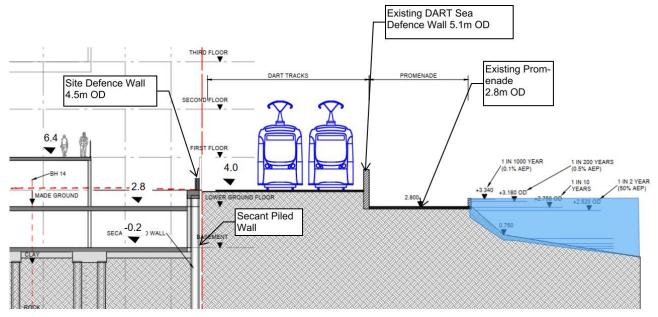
, shows a typical section along the site boundary, showing the existing and proposed sea defence structure.
